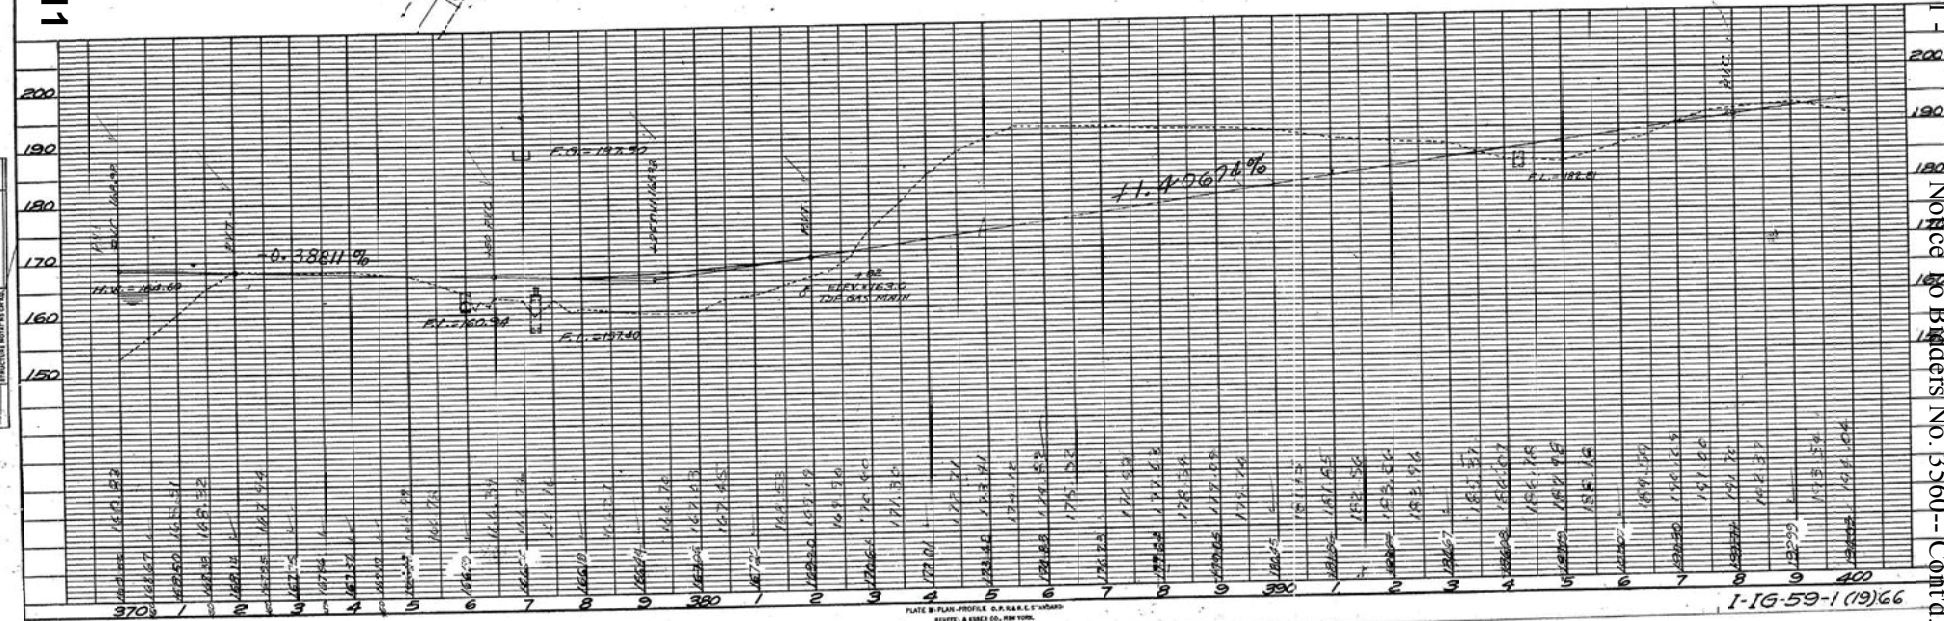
PLATE B - PLAN PROFILE U.S. & A.E.C. FORM NO. 1
